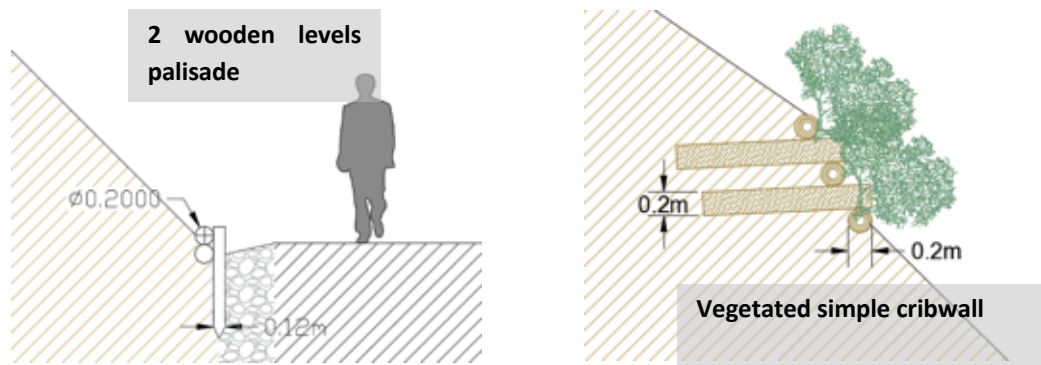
Profile view for the palisade and simple cribwall planned in Action 8.
